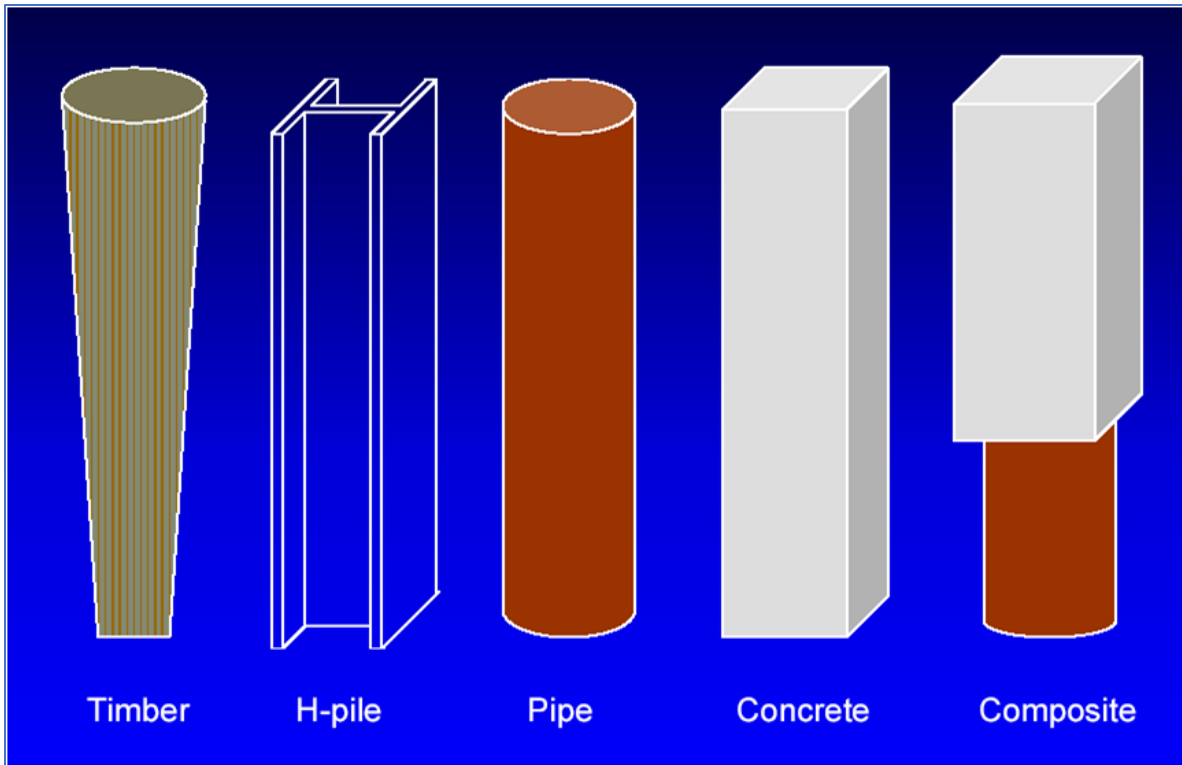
Typical Materials used in Piles (Engineering Discoveries, n.d.)
